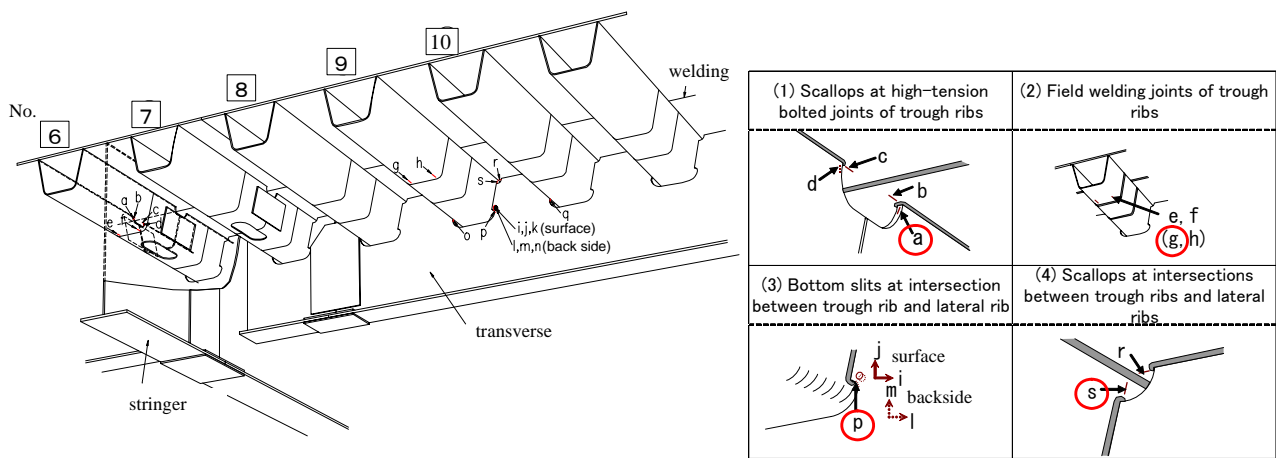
Stress measurement locations in the Ohnaruto Bridge
